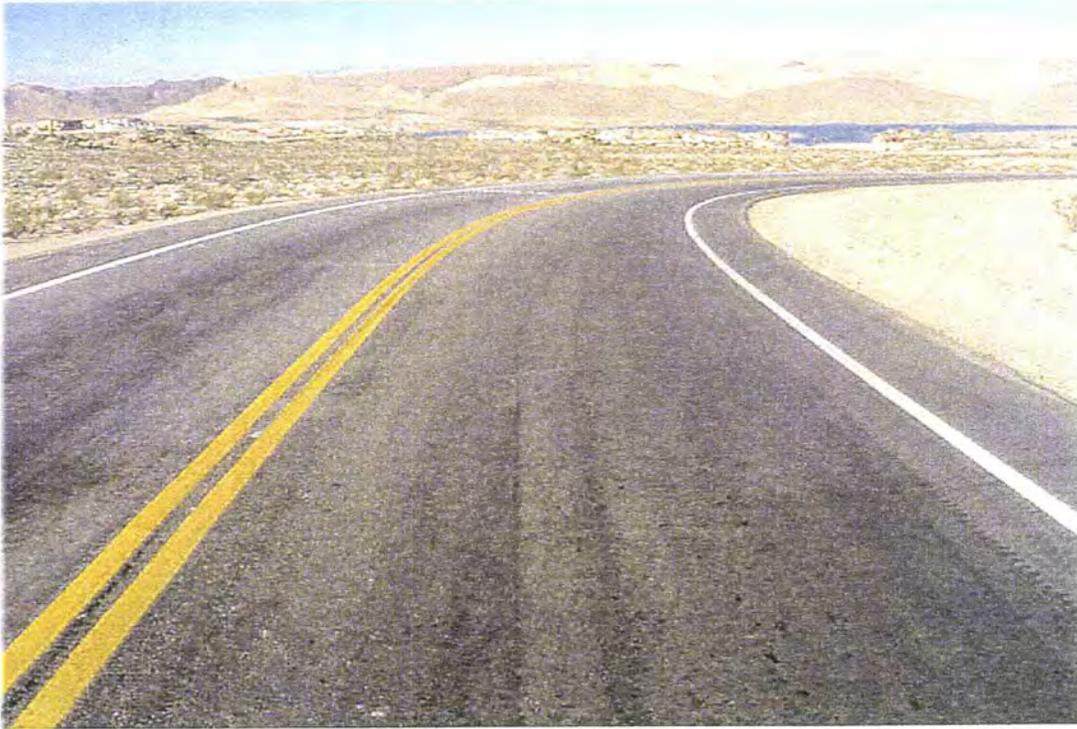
MP 0.00 Northshore Road - Typical Pavement Section
